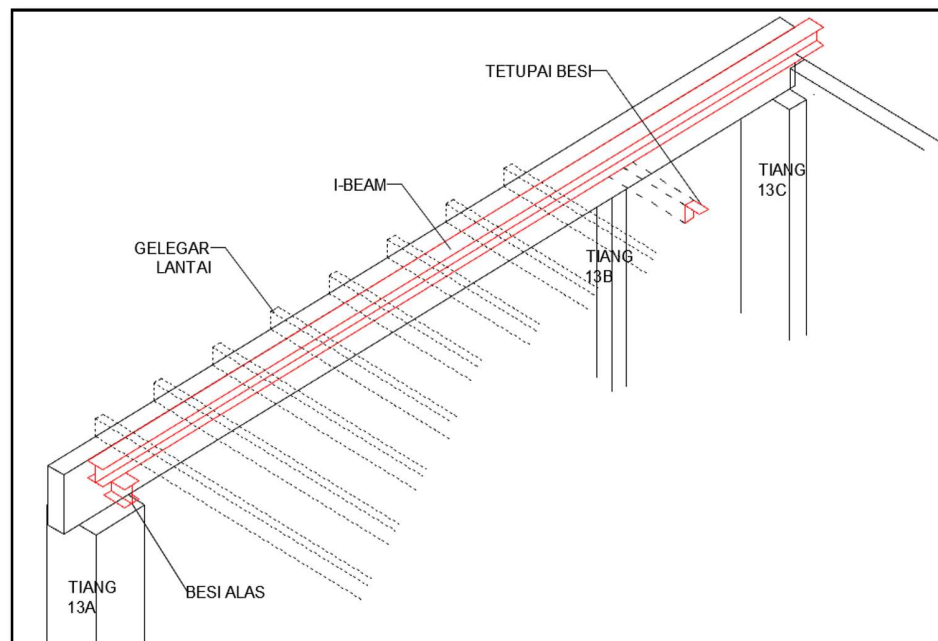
The new I-beam takes over the original timber beam by transferring the floor joist loads. The original exposed timber beam is preserved for aesthetic authenticity.
